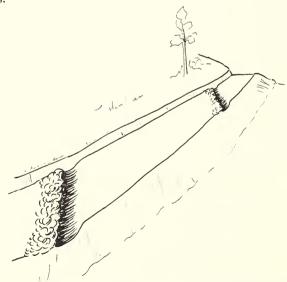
Water bar (earth-berm type). Like culverts, water bars should cross road at a 30-degree angle downgrade.
